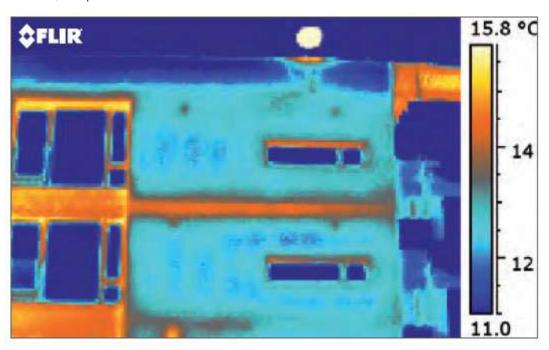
Thermal bridge at the ceiling (FLIR Systems)
